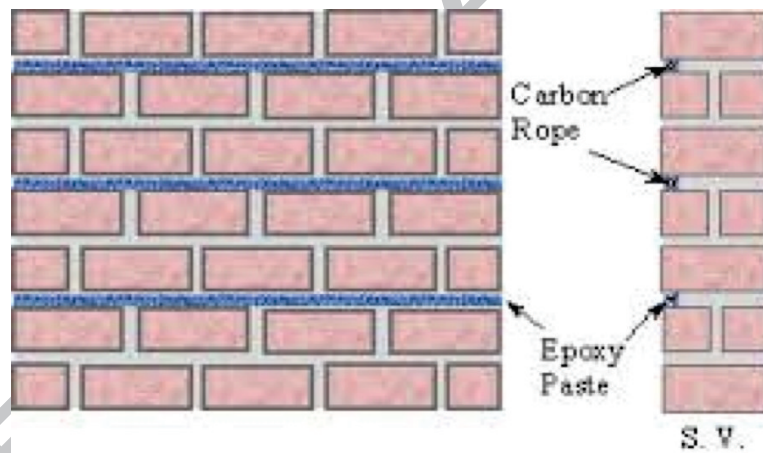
Installation of FRP rod as horizontal reinforcement (korany-drysdale2004)
